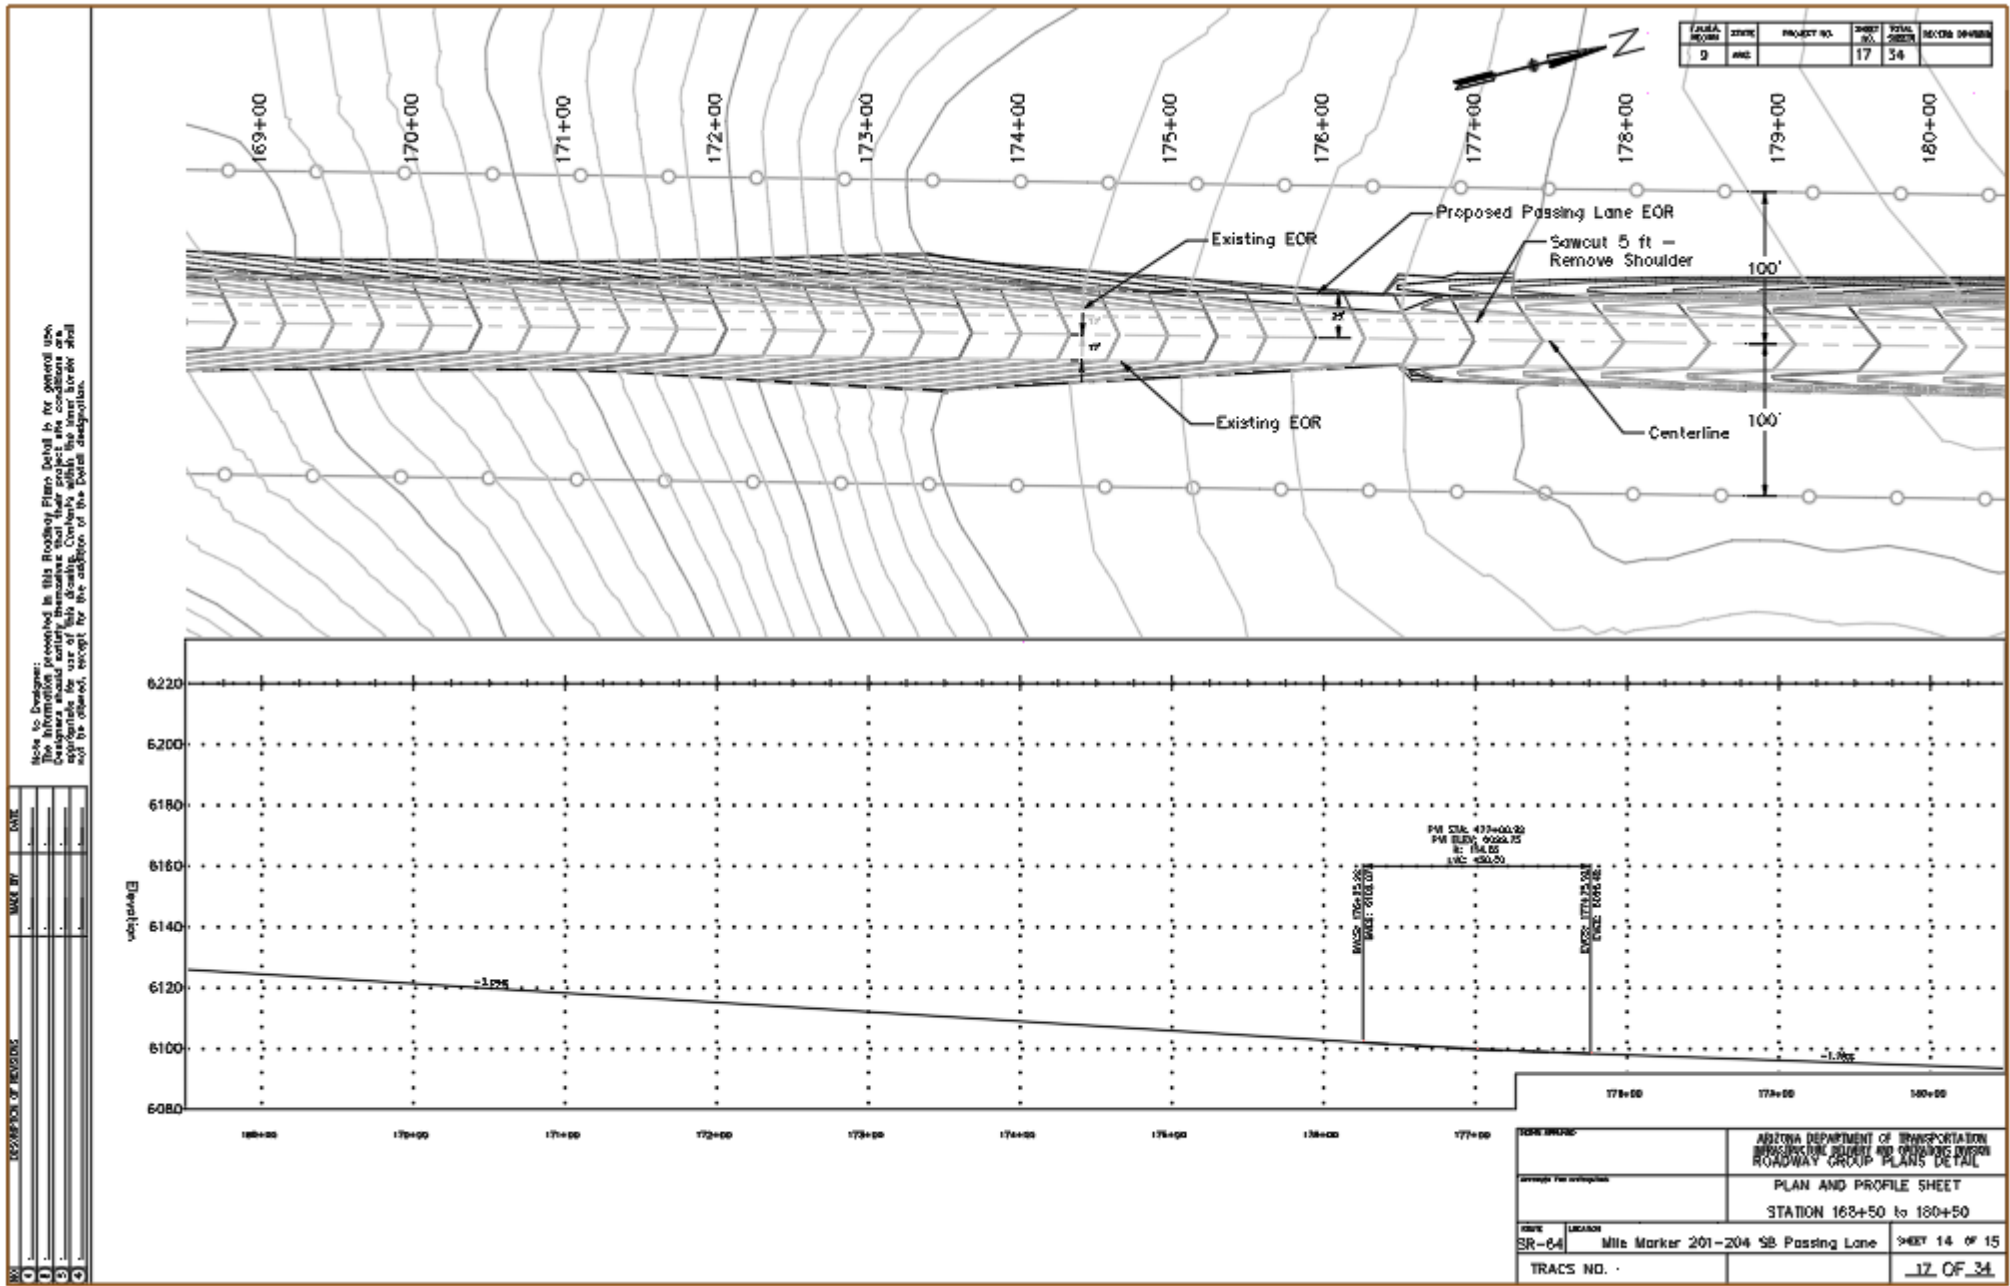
Plan and Profile Sheet Sta. 168+50-180+50 [7]
